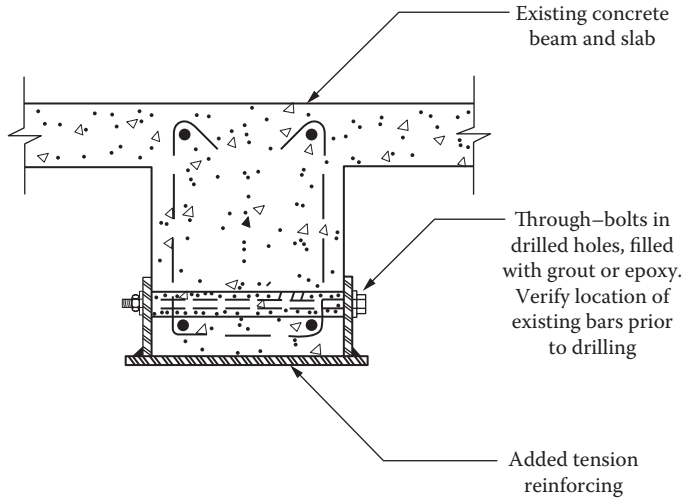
Bolting a built-up steel member to improve the positive moment capacity of an existing concrete beam.
